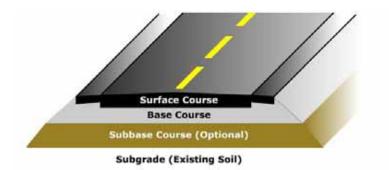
Cross section of pavement design (Washington State Department of Transportation, 2007)
